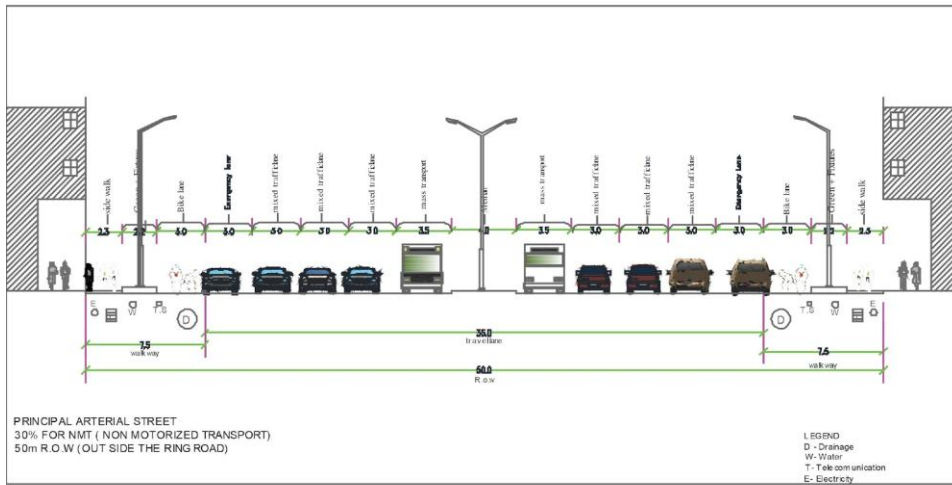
Street section (a) of Principal Arterial Road outside the inner ring road
